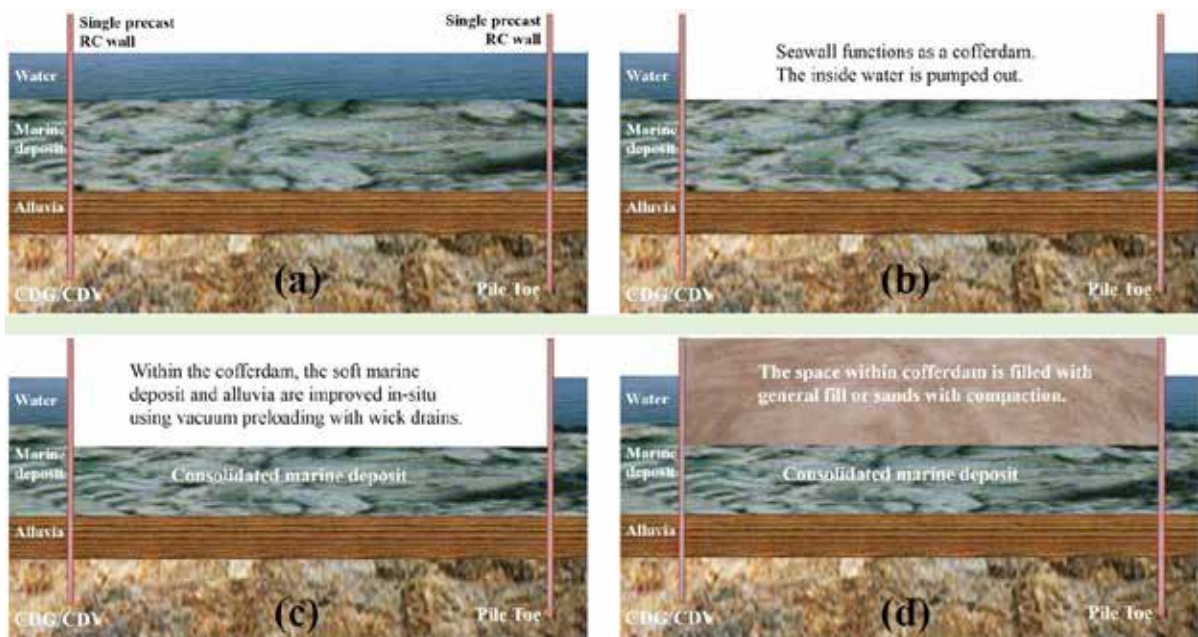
Lateral cross-sections of the conceptual seawall design and construction with single pile wall
